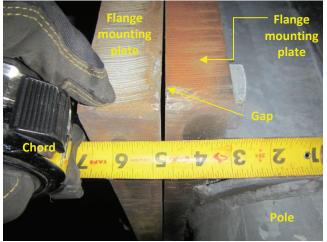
Gap in flange mounting plates of mast arm to pole connection
